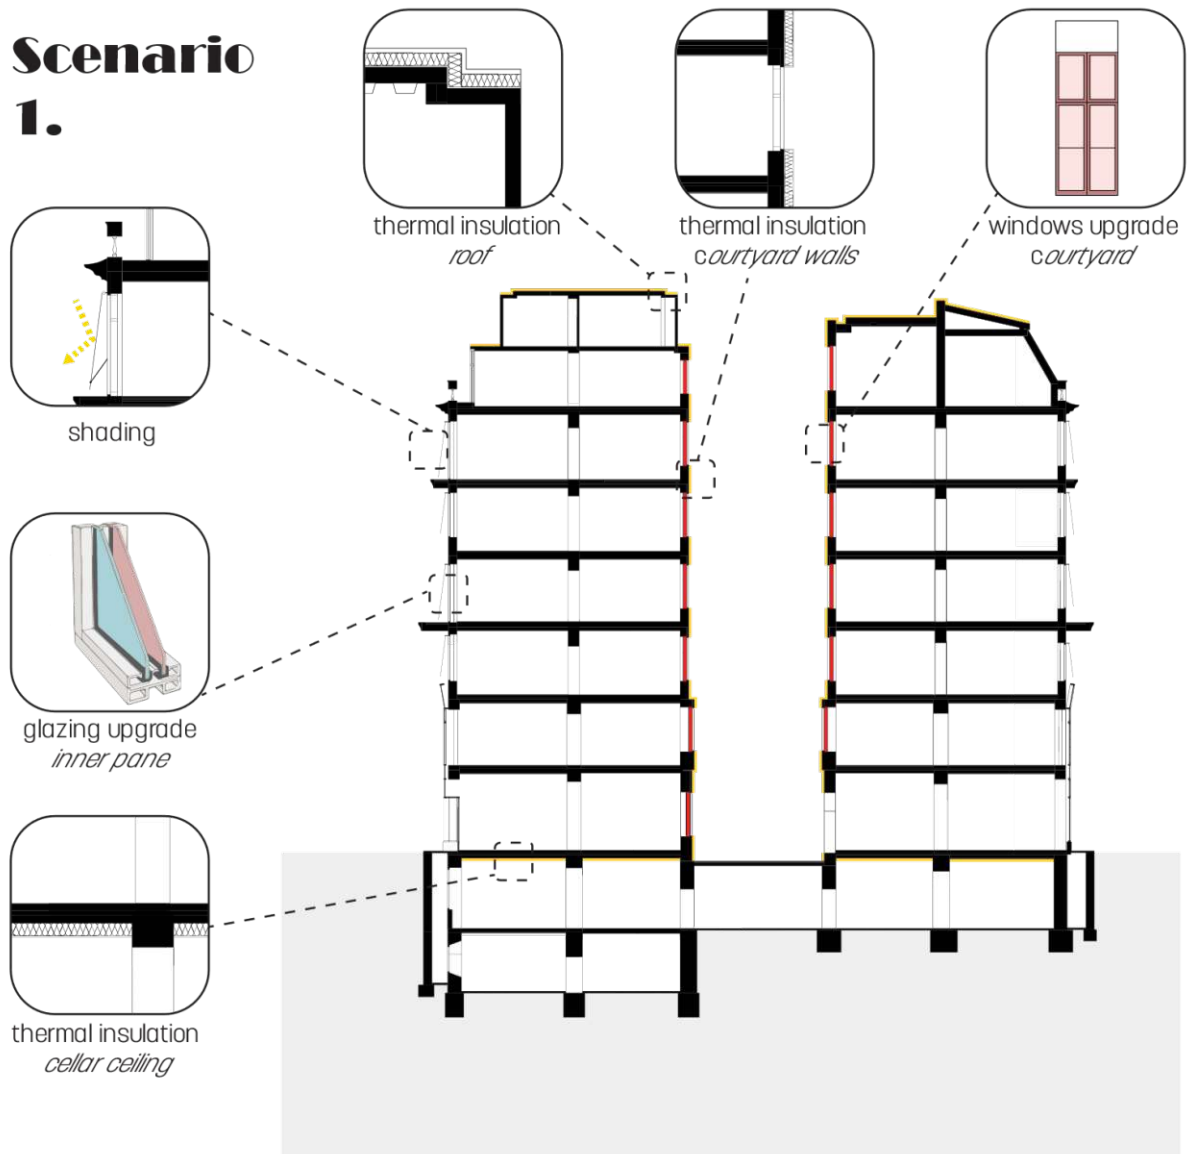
Scenario 1: thermal insulation of the roof, backyard walls, cellar ceiling, glazing upgrade front façade, windows upgrade backyard, shading.
